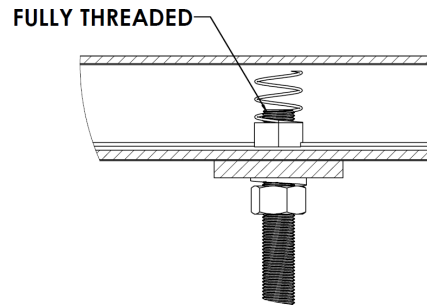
Threaded Rod Fully Threaded into the Strut Channel Nut
